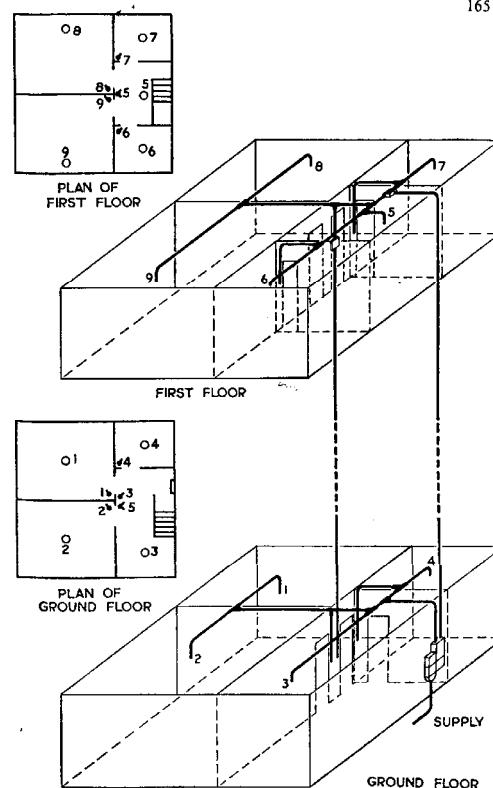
Layout of conduit for electric lighting in typical semi-detached house
